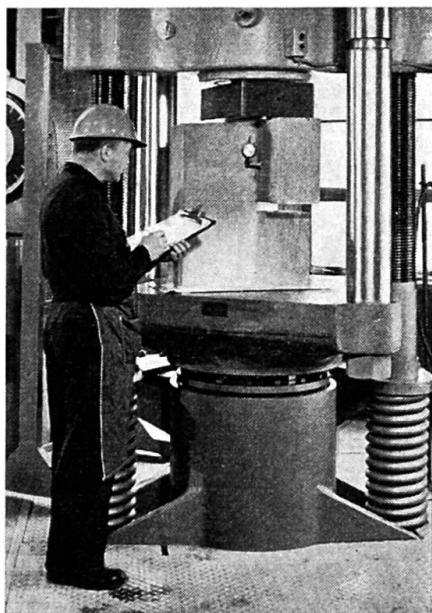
Horizontal Shear Test using "Push-Off" Specimen.
